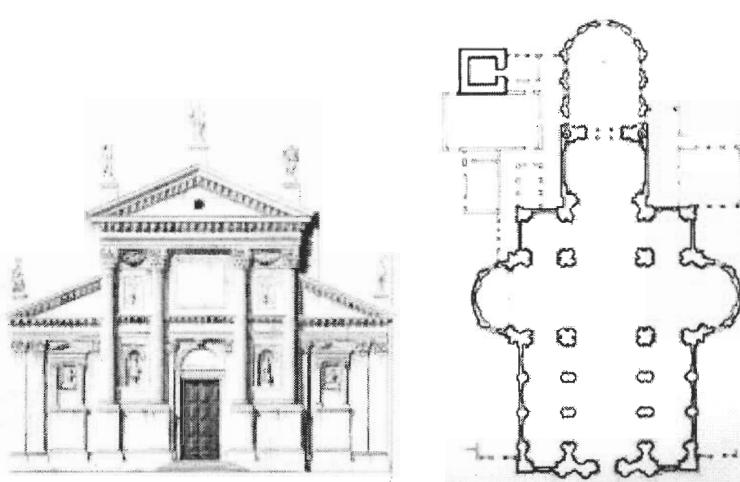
Façade and Latin cross floor plan of San Giorgio Maggiore.
